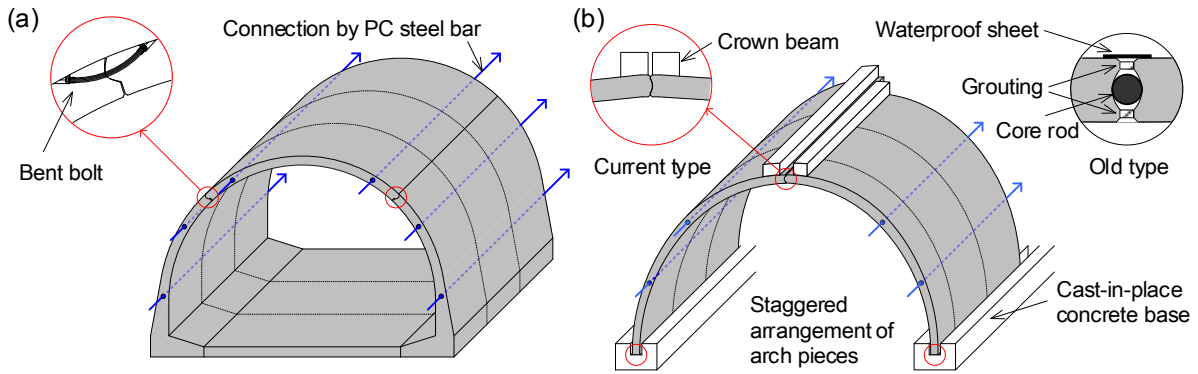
Structural connectivity of culvert longitudinal direction in precast arch culvert in (a) two-hinged arch culvert and (b) three-hinged arch culvert (Association of Modular Construction Method, 2017 and Advanced Construction Technology Center, 2014).
